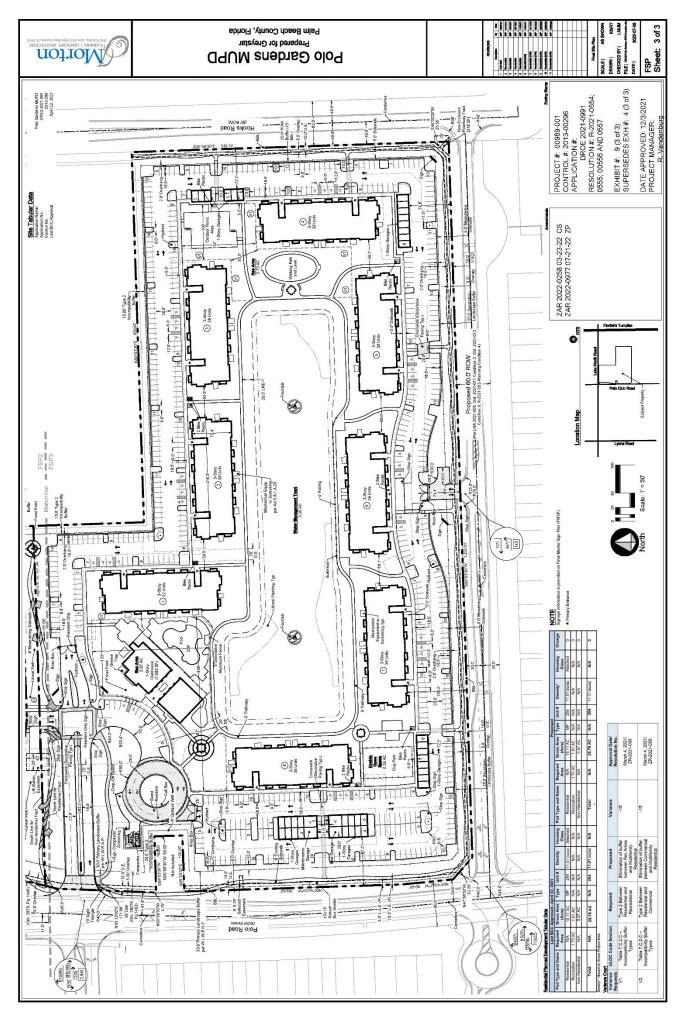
Approved Site Plan Dated December 3, 2021 (Page 3 of 3)
